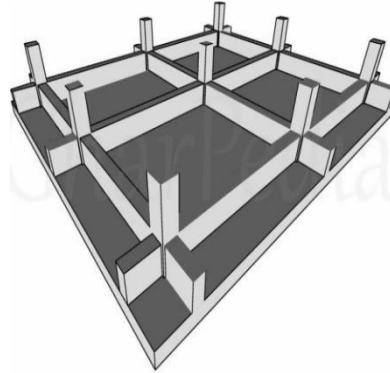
Two-way beam and slab. (Bowels, 1996)
